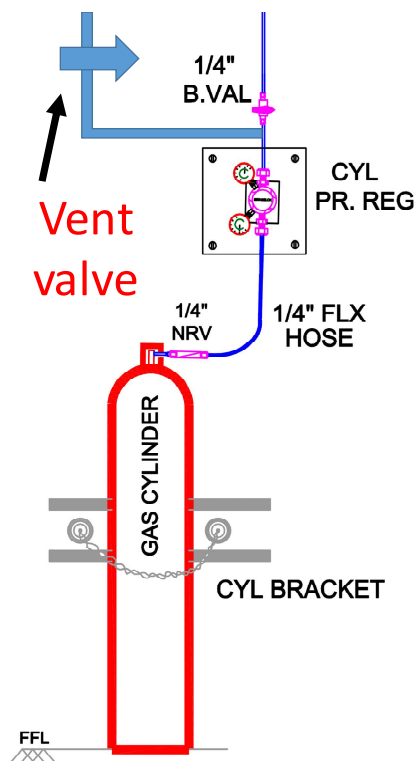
A typical cylinder connection layout for the HP lines with 1 cylinder.
